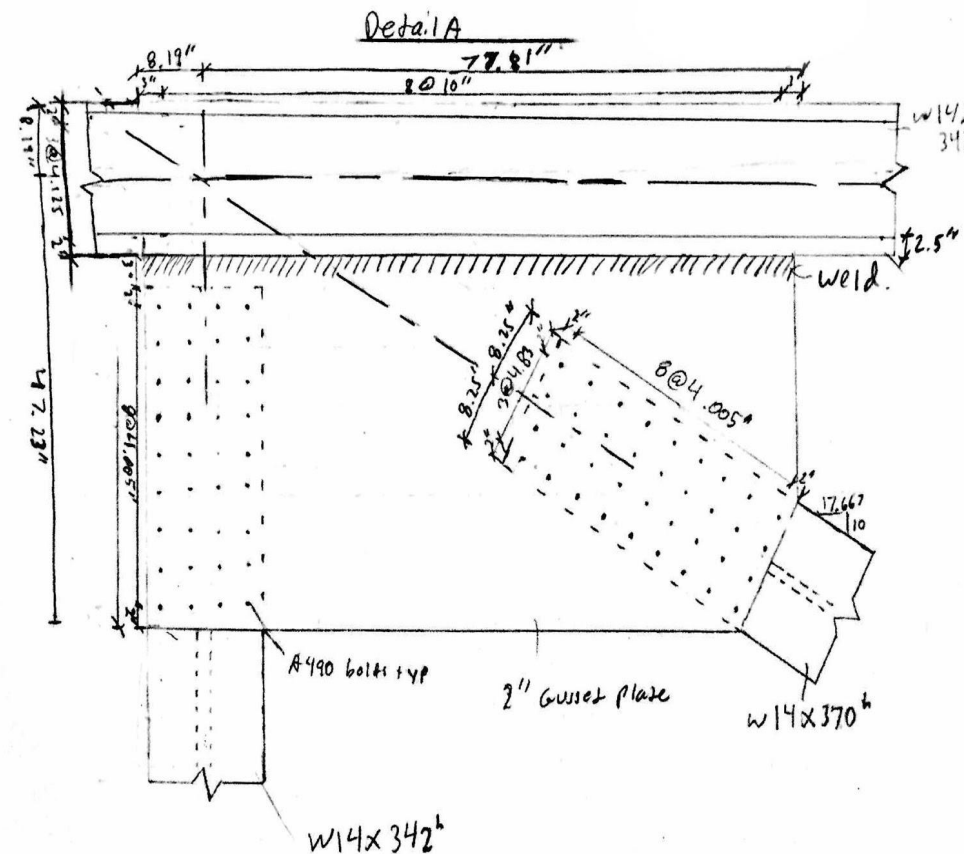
Detail of cantilever truss connection (circled in Fig. 23).
